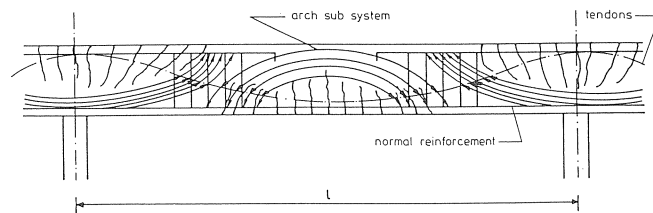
Transfer of load to support (sufficient longitudinal reinforcement).
